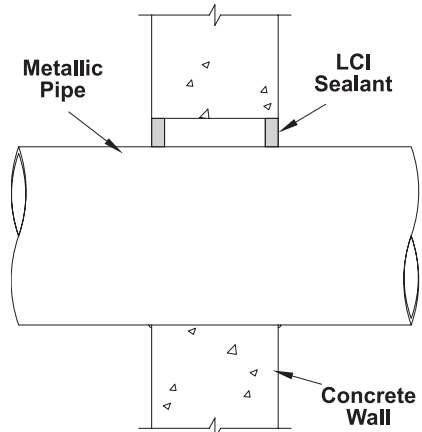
METALLIC PIPES - Concrete/Masonry Floors & Walls
